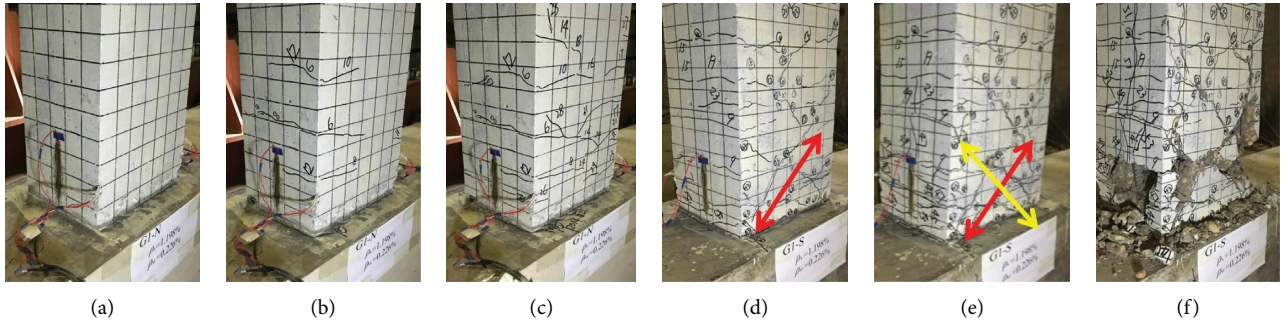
The damage phenomenon of the specimen. (a) No visible cracks. (b) Multiple horizontal cracks. (c) Horizontal cracks connecting end to end. (d) Unidirectional oblique cracks. (e) Intersecting cracks. (f) Concrete crushed.
